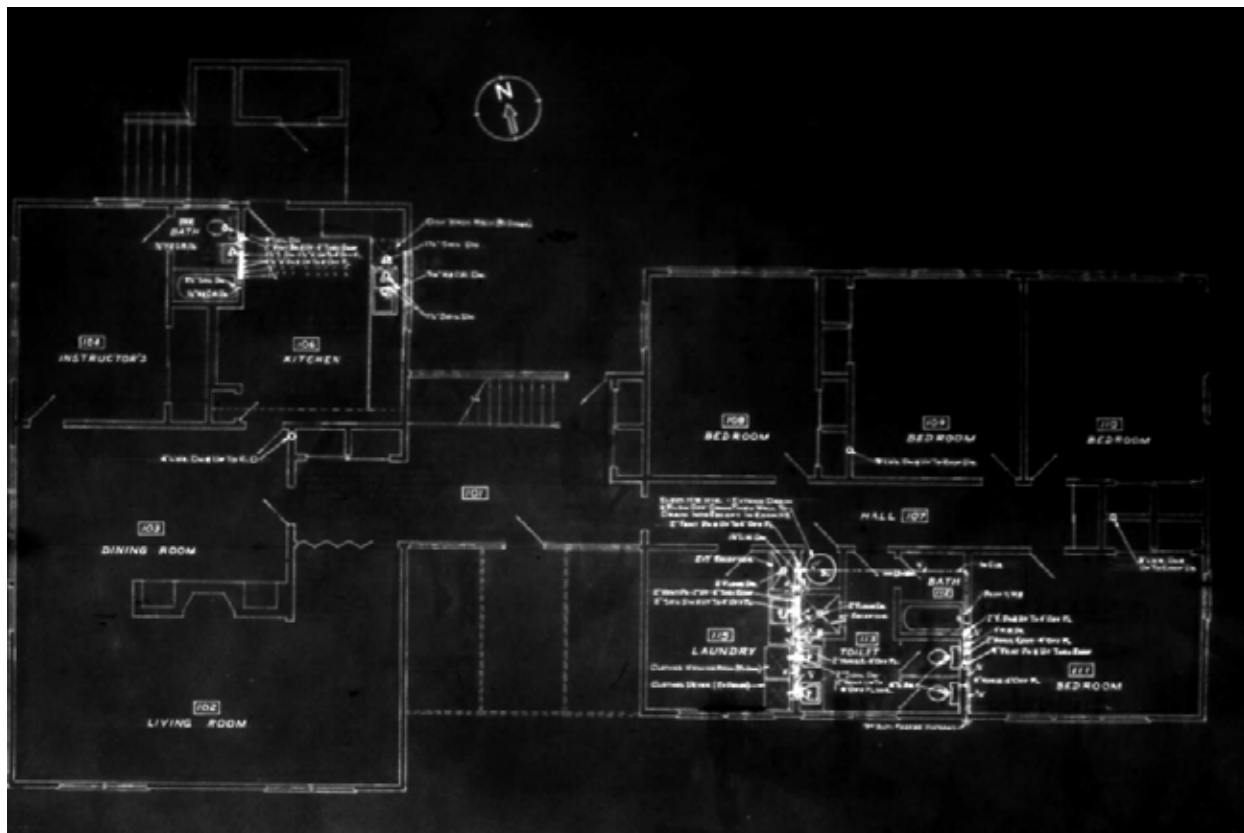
First floor plumbing plan for the Home Management Laboratory by Freeman French Freeman Architects, November 14, 1960, showing the original layout of rooms in Blundell House. Courtesy of UVM Special Collections.
